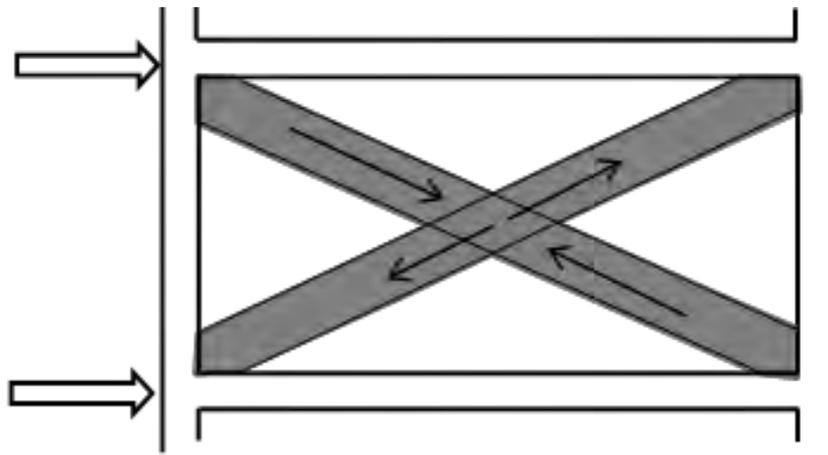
(b) Infill wall is depicted by diagonal compressive strut (Madan et. al, 1997)
